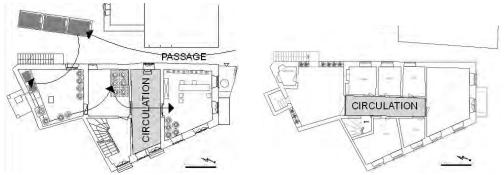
Ground and First Floor Plans (Restitution Drawings)
